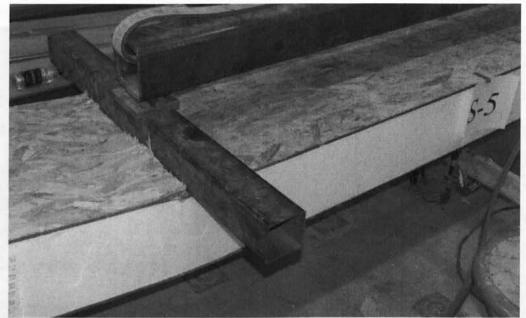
Close-up view of panel S-5 after failure showing OSB top facing crushing at the quarter point load location
